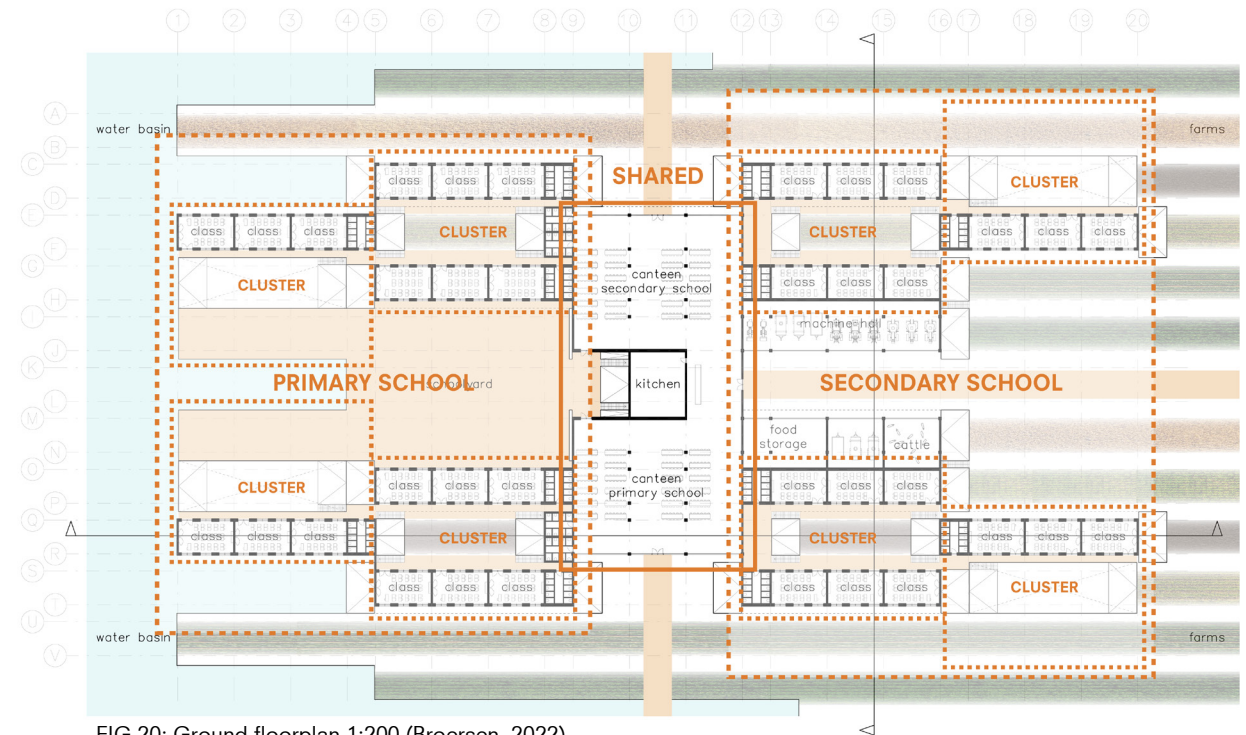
Ground floorplan 1:200 (Broersen, 2022)
